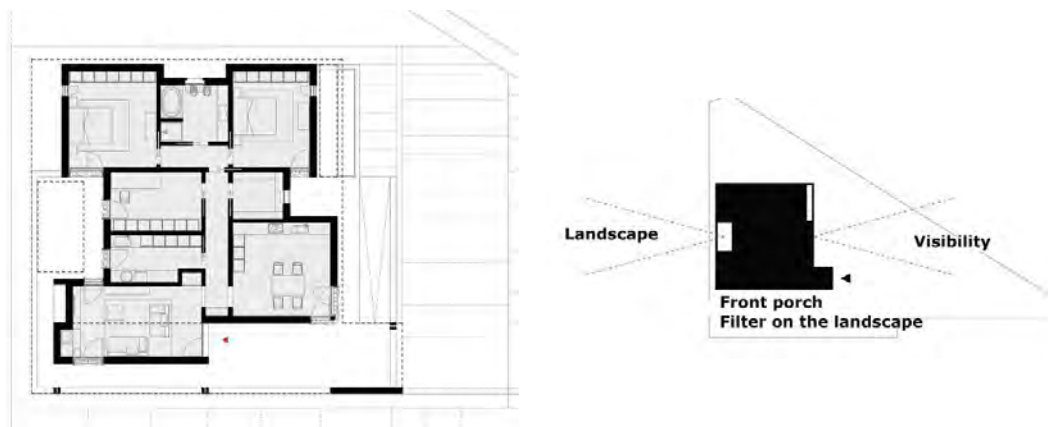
The Flower house, Mirandola, Modena, (KM429 Architects). Floor plan and visual layout. The house is spread on over one compact ground-floor, typical of the places. In addition to the porch on which the living room and kitchen overlook, two loggias have been created to the east and west, marked by the presence of green flowerbeds.
